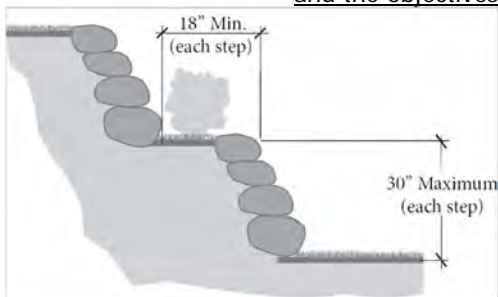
B.1: Allowable terrace configuration for wall or rockery adjacent to a public sidewalk. Note that this illustration shows a stone wall but other masonry and concrete walls are acceptable as well.
